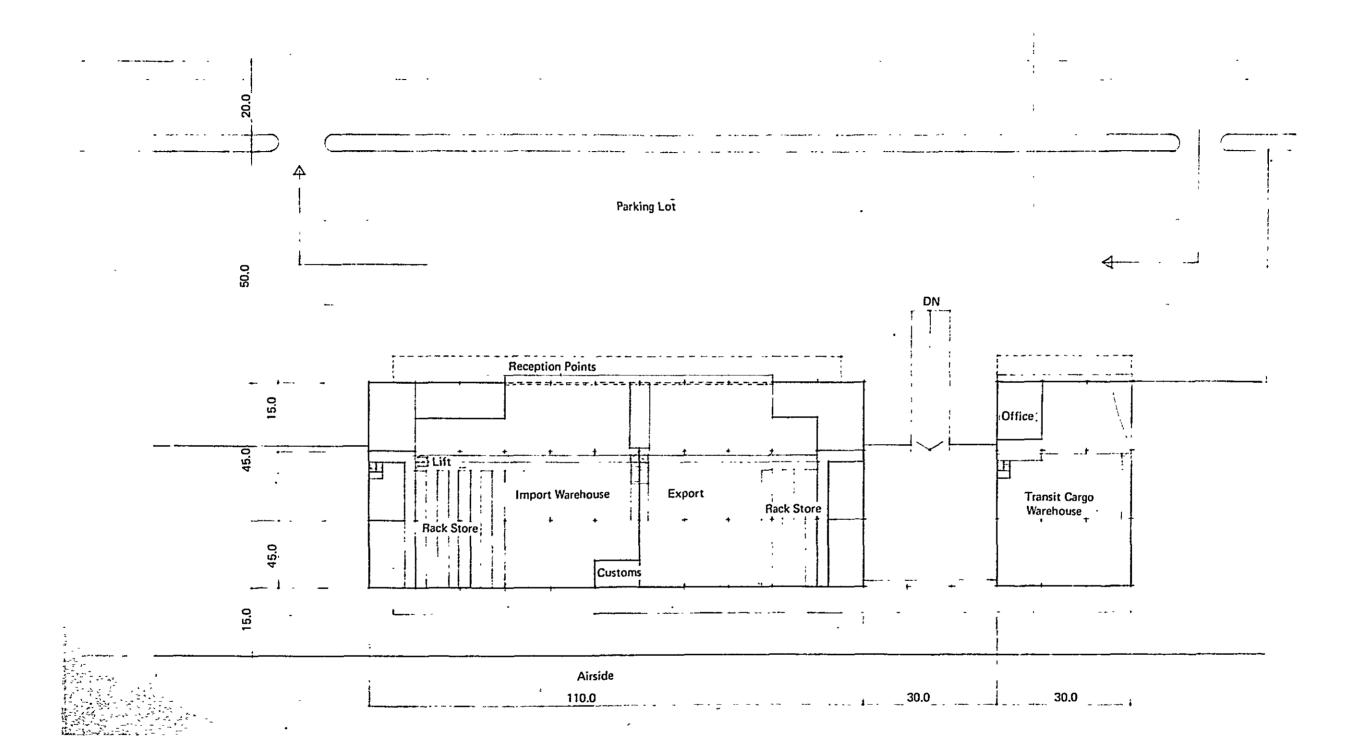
Proposed Cargo Terminal Bldg. Basement Floor Plan
